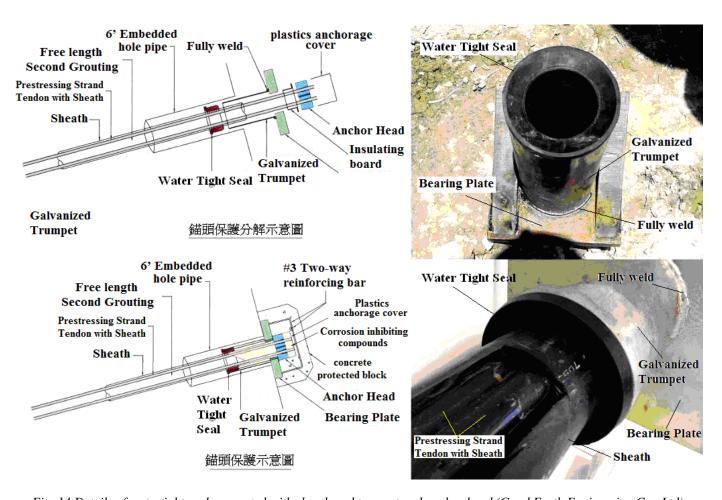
Details of watertight seal connected with sheath and trumpet and anchor head (Good Earth Engineering Co., Ltd)
